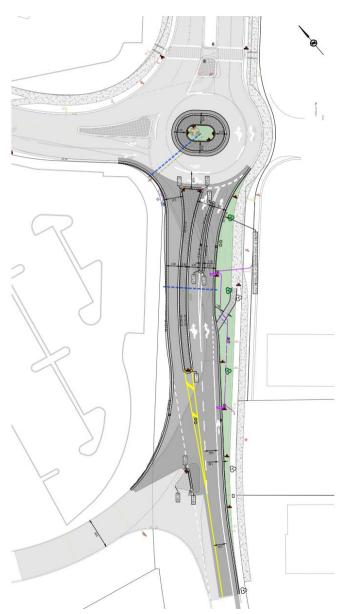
Proposed West Shore Parkway and Amy Road Roundabout
